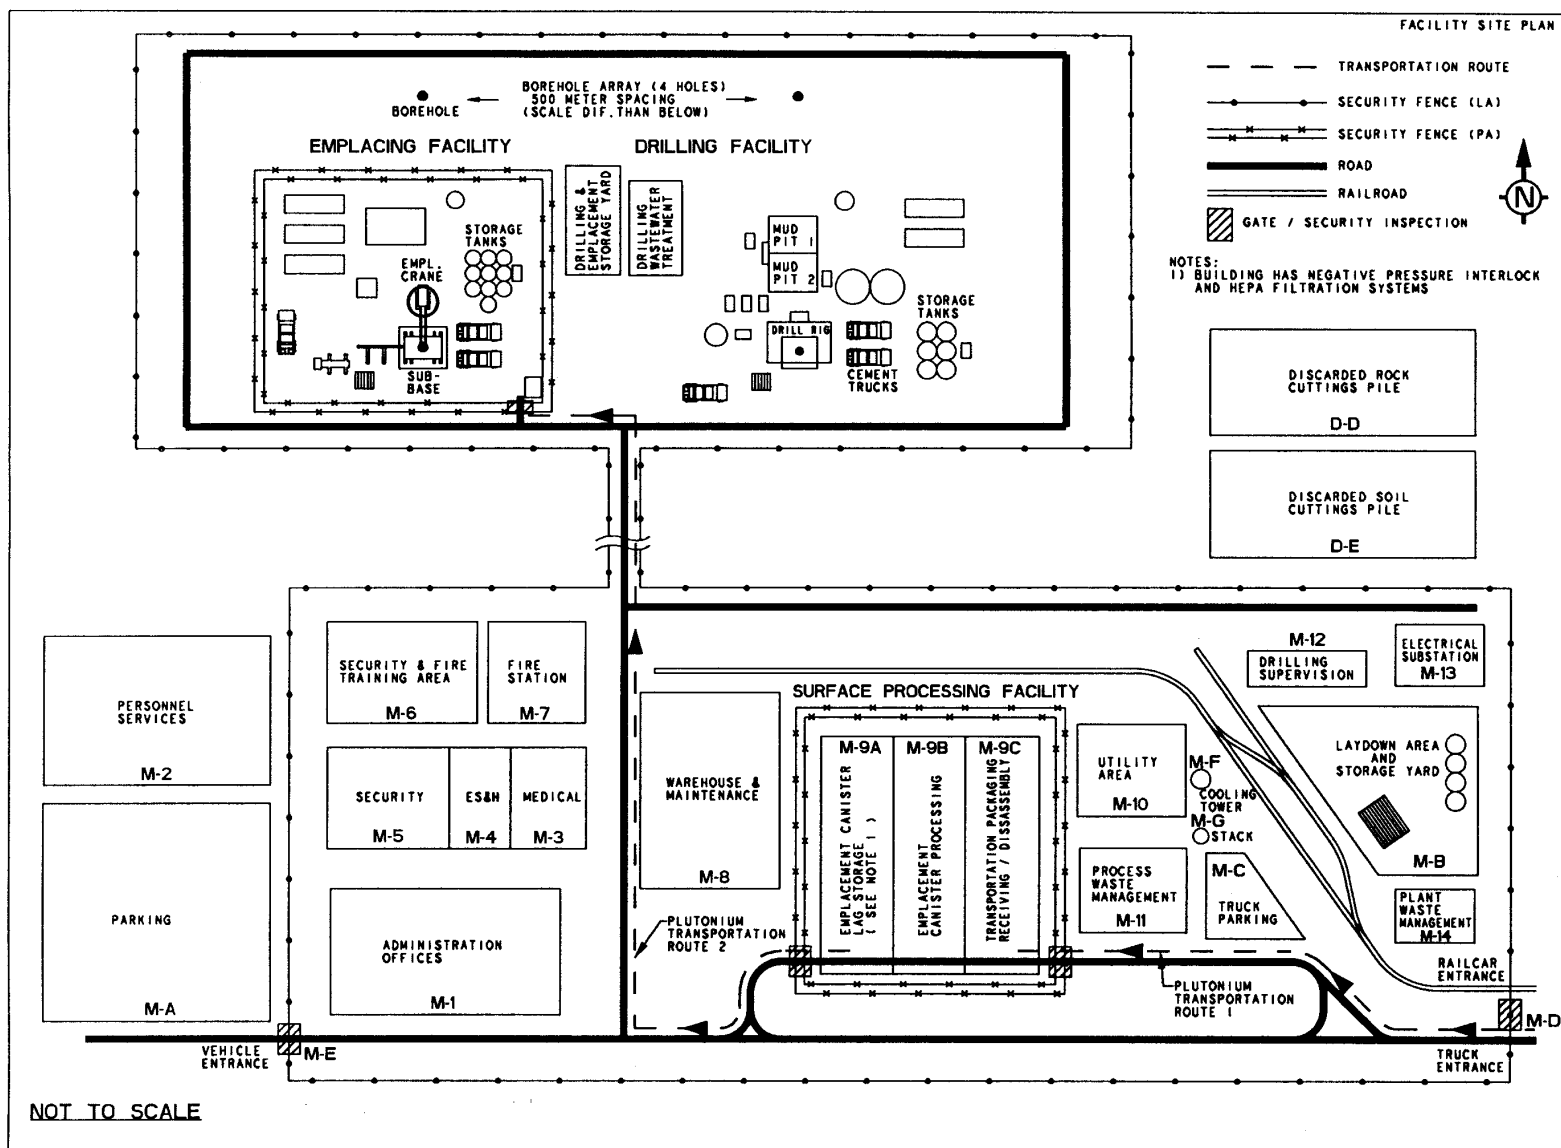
Deep Borehold Disposal Facility Site Plan Detail and Plutonium Transportation Routes.
